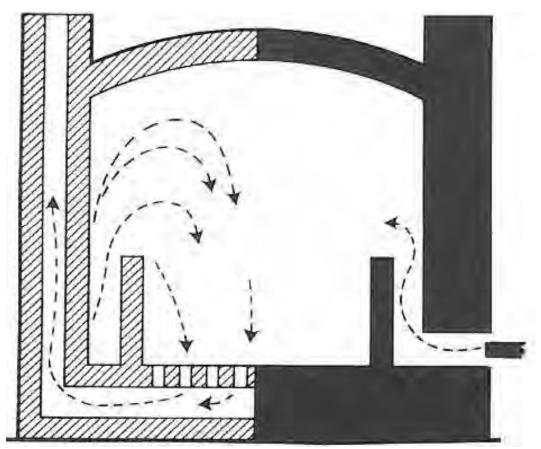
Section through a Downdraught kiln. (Source: Alan Cox, Brickmaking: A History and Gazetteer, 1979, p 26)
